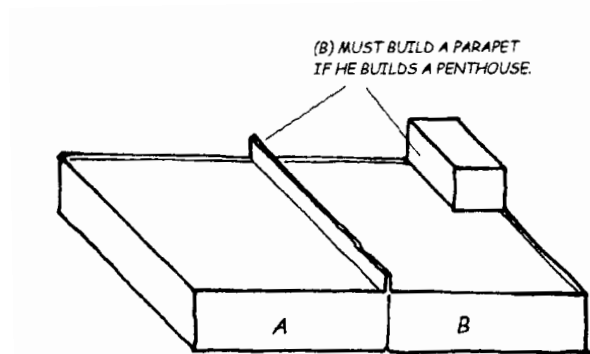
A property owner that wishes to add a penthouse to the roof of his property must construct a parapet wall between his and the adjacent property (Source: Hakim, B., 2001, p.18).
